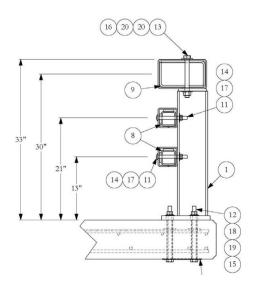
Schematic of TxDOT T131 Bridge Rail [28]
